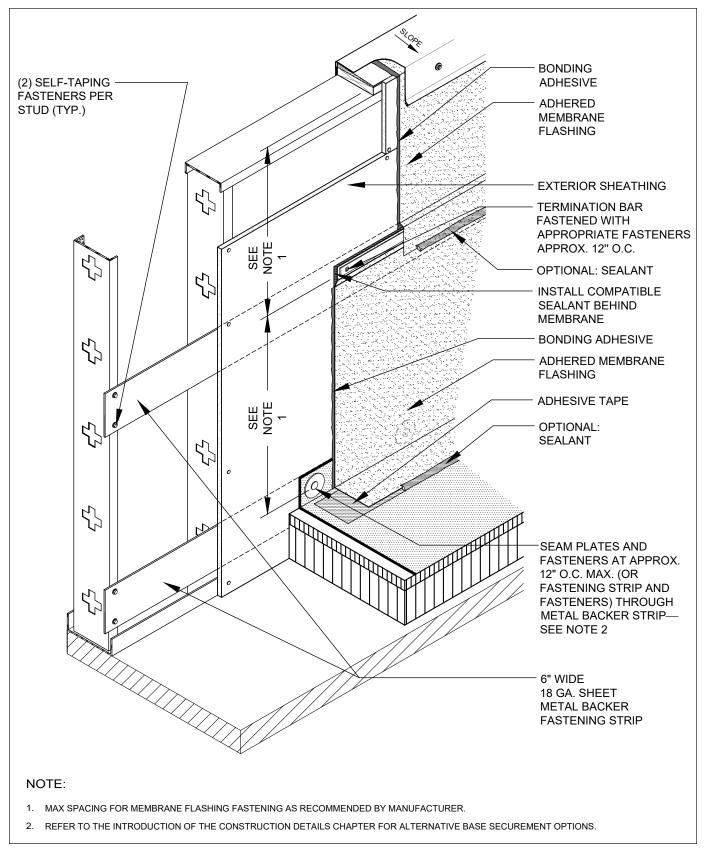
Base securement for EPDM membranes at a steel stud wall with steel fastening substrate
